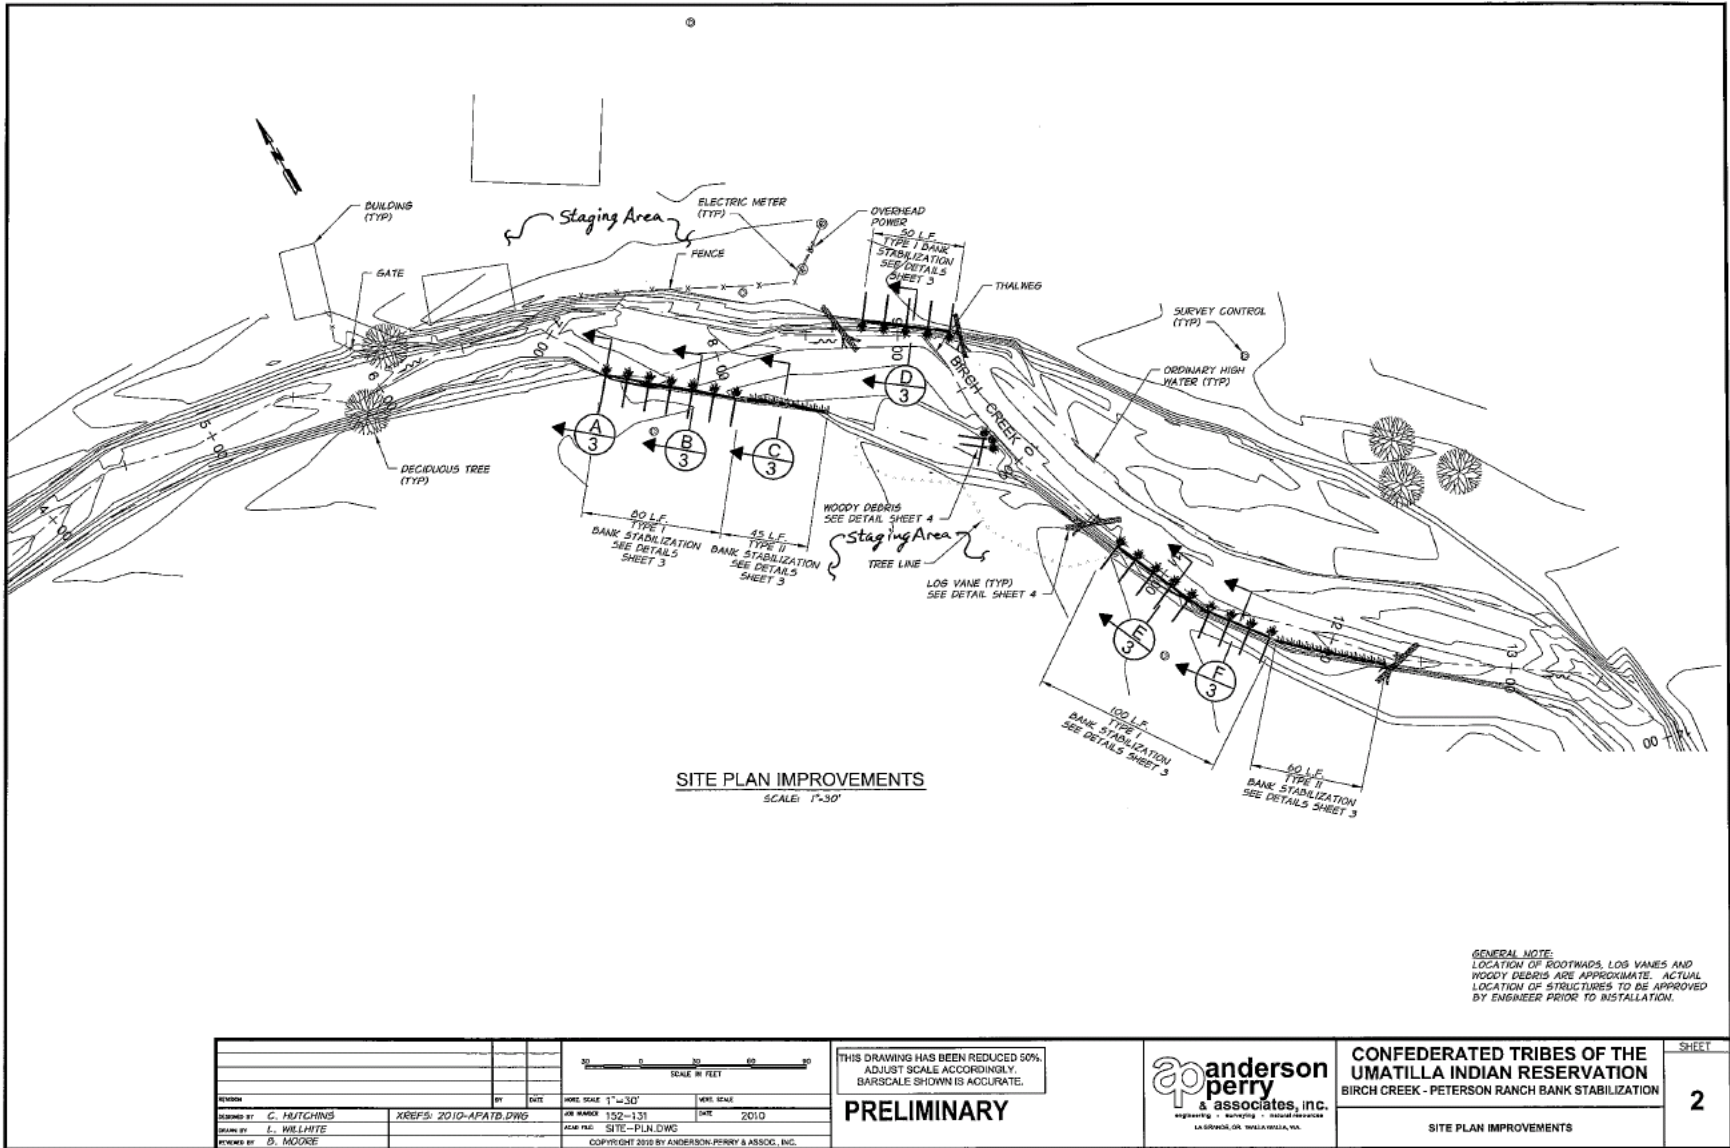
Engineer Design Site Plan Improvements, Birch Creek, RM 2.8
